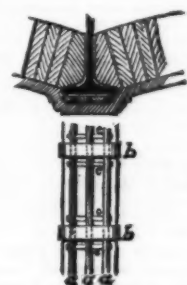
PROTECTION OF LOWER FLANGE OF FLOOR BEAMS.
